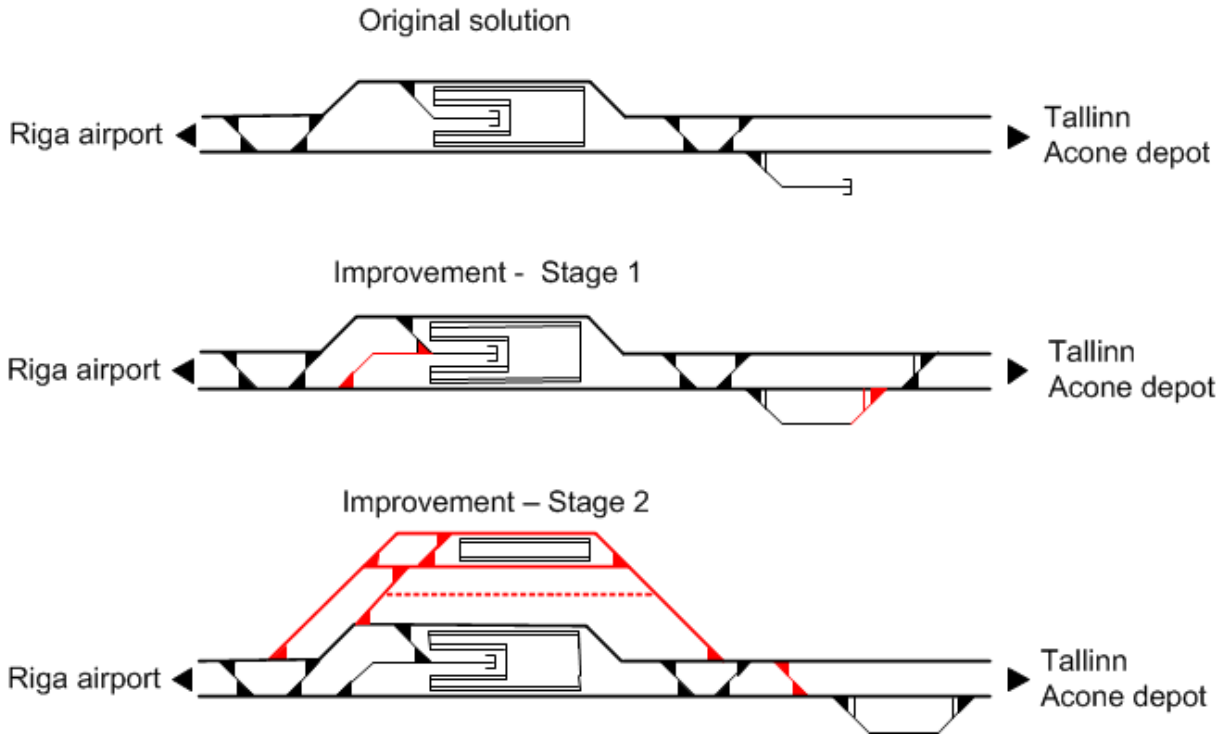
Riga Central station layouts: Original solution, Improvement Stage 1 and longer-term Improvement Stage 2
